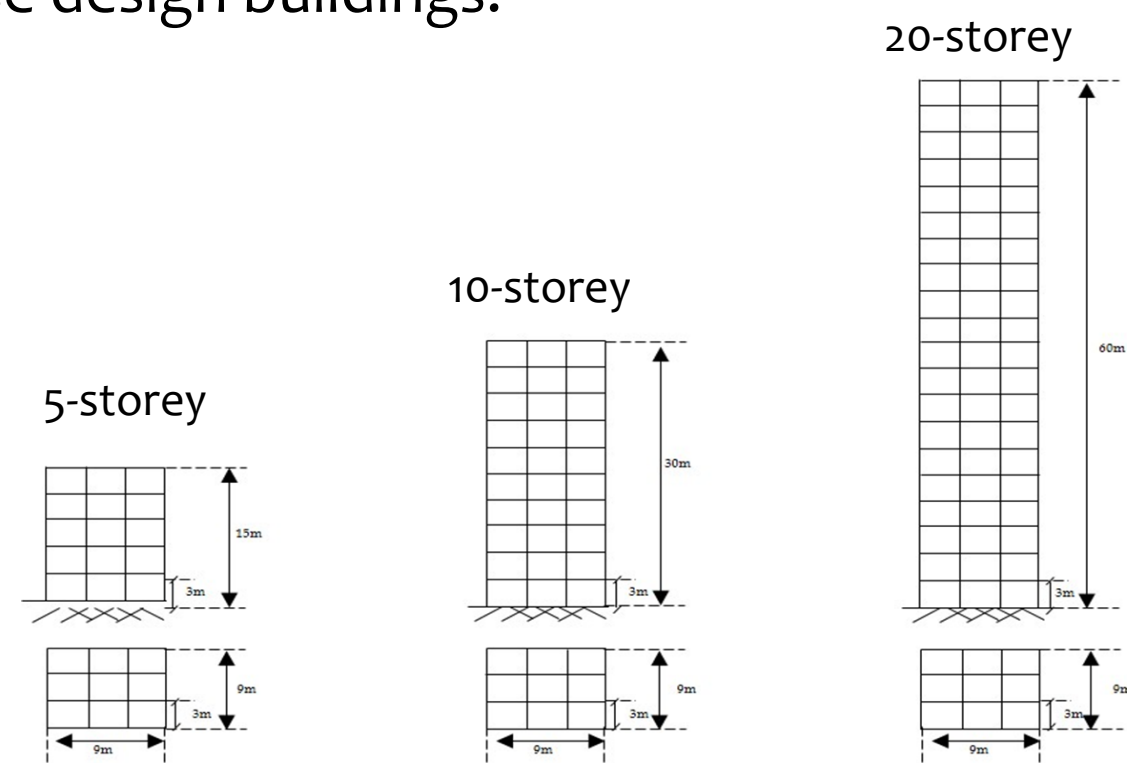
Plan and Elevation of Low, Medium and High-rise Buildings
